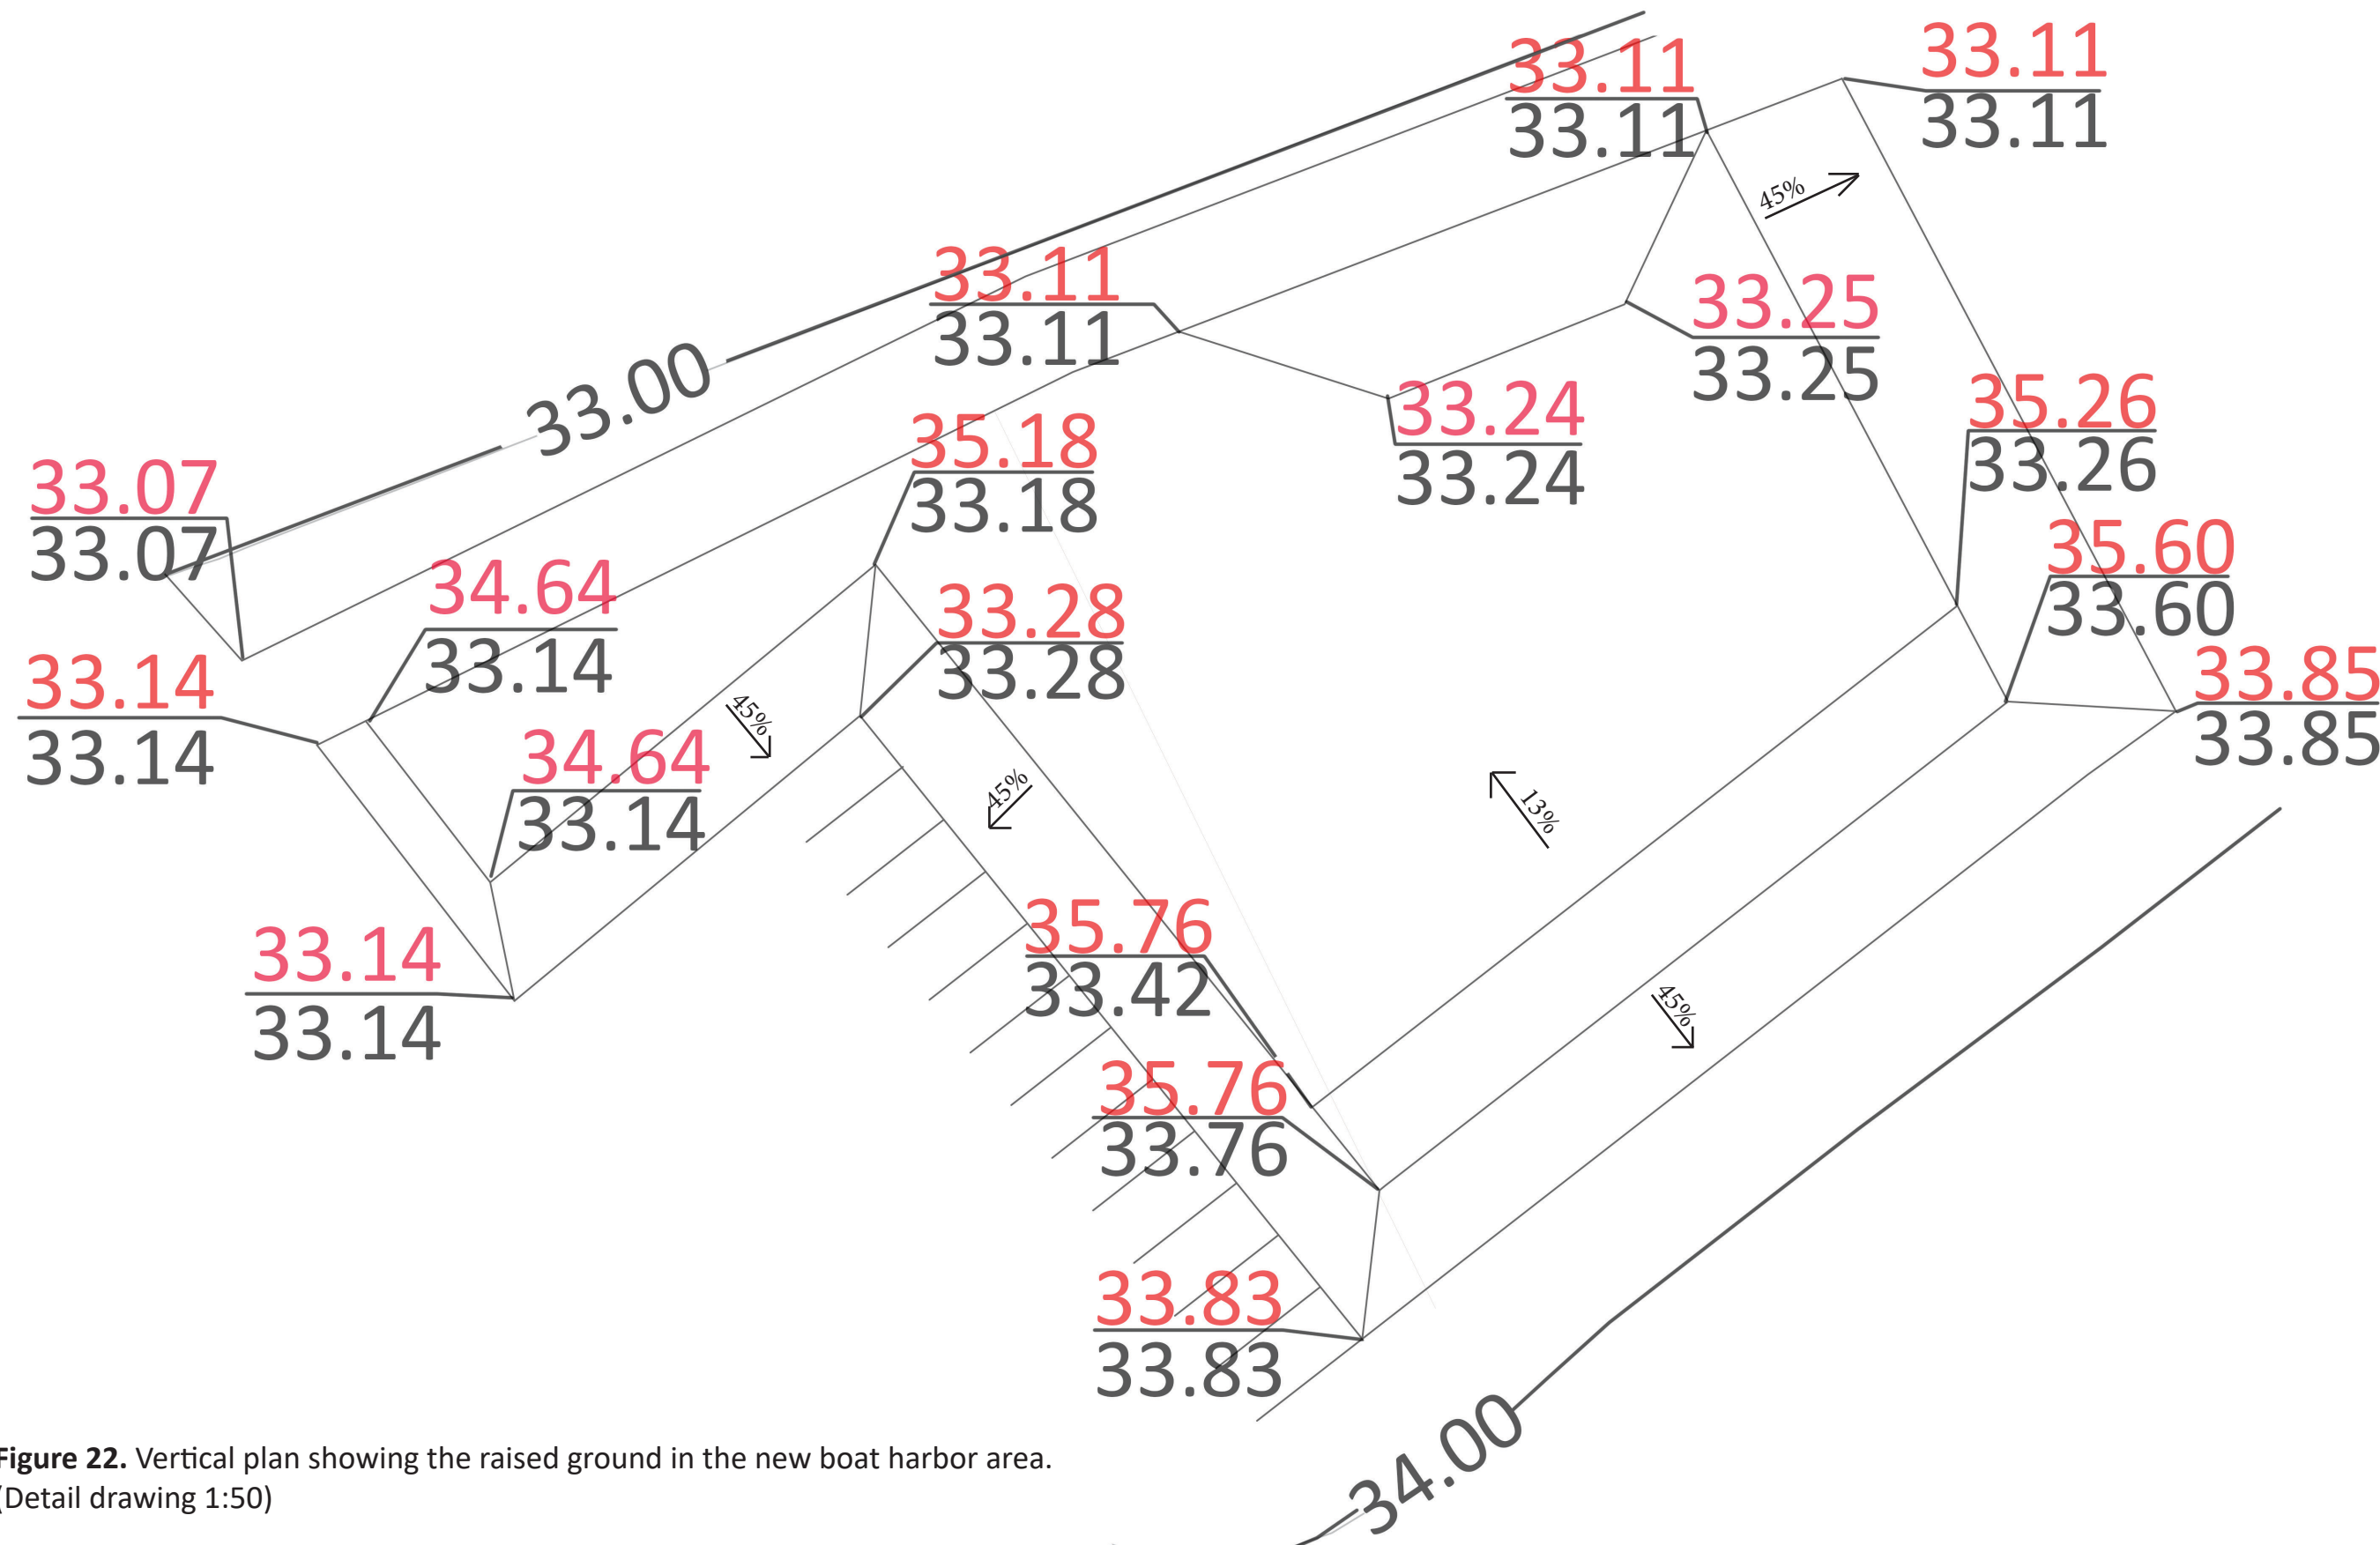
Vertical plan showing the raised ground in the new boat harbor area.
